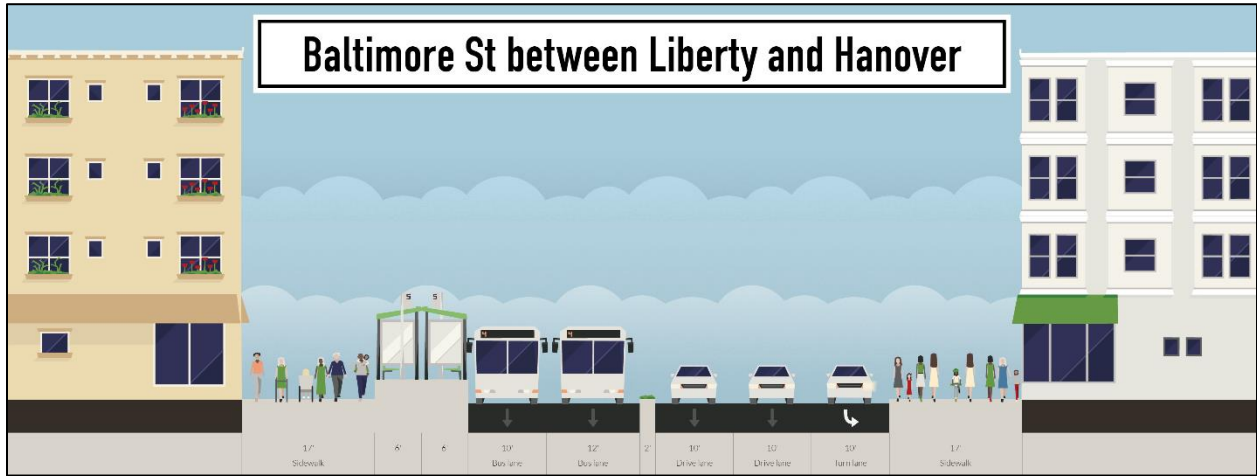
Cross section for BRT on Baltimore and Fayette Streets at Charles Center Metro Station
